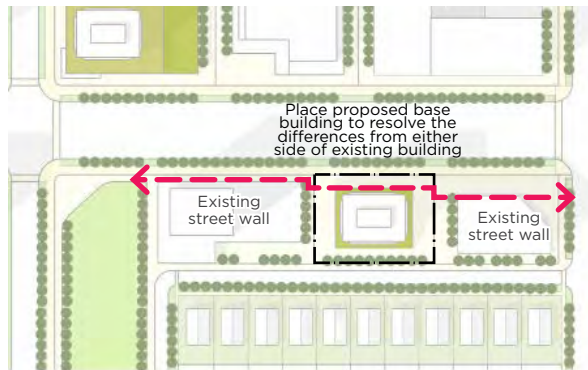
Building placement on an existing well-established street wall that varies on either side of the proposed high-rise building site
